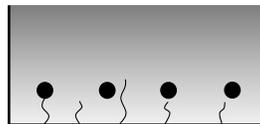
Conceptual figure for micro cracks around a concrete cover.
